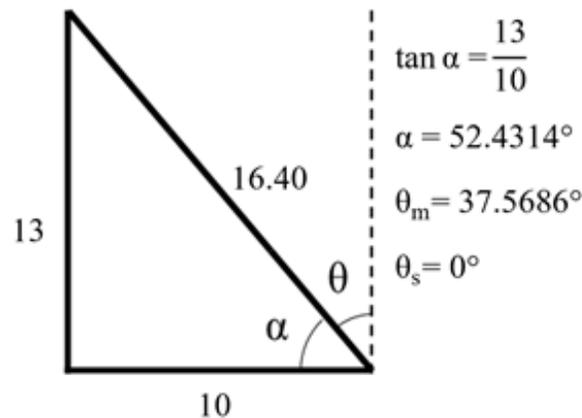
Bracing B Top Tier Member Lengths and Orientation
